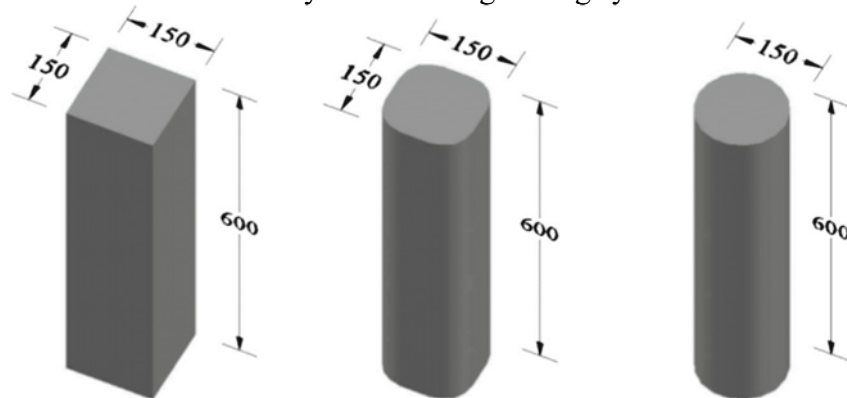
Specimen geometry and cross section shapes (dimensions in mm)
